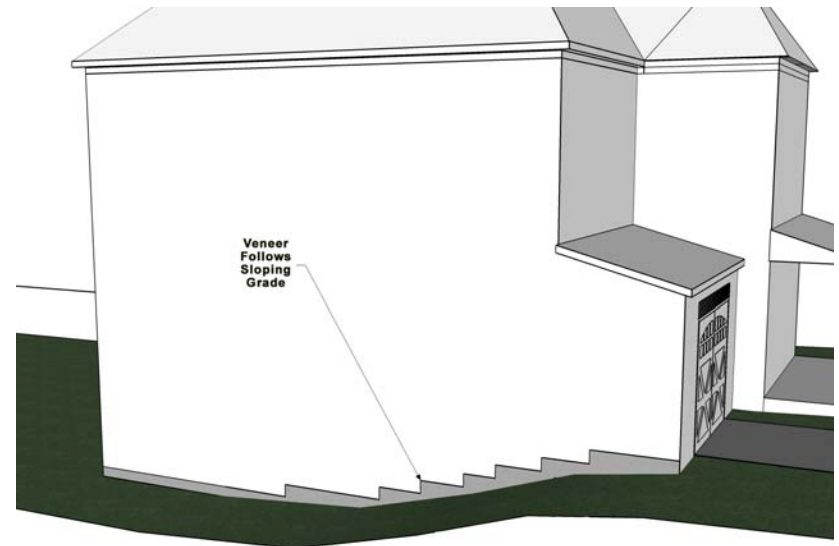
Exposed foundations walls shall be avoided where exposed to public view
